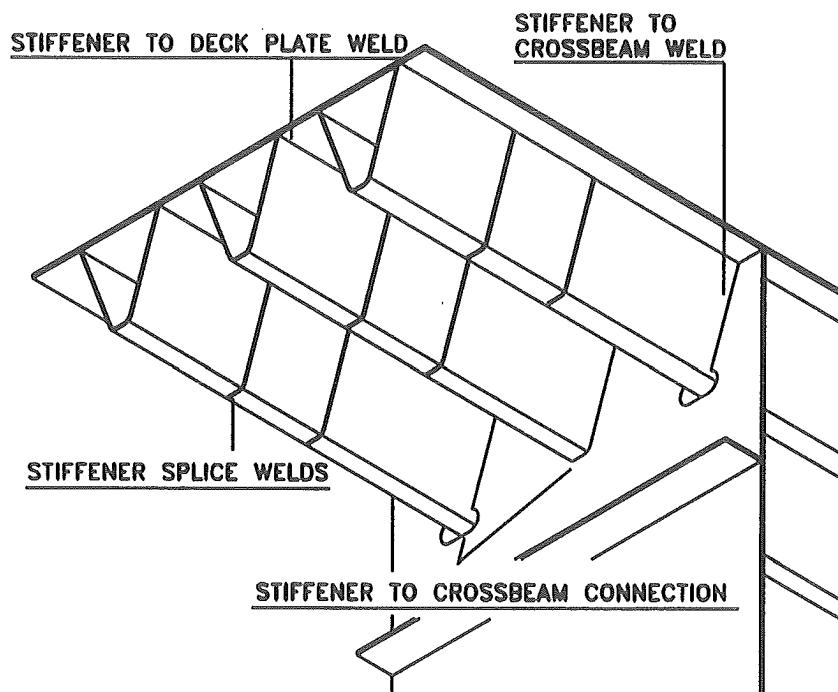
Main welded connections in a typical orthotropic bridge deck.
